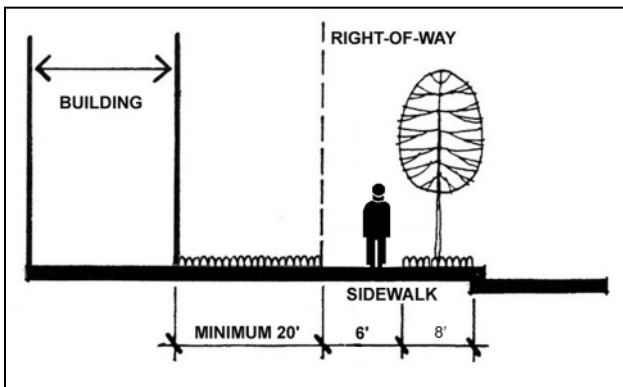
CE setback and building placement will make buildings more prominent by reducing the distance from the edge of the road.
